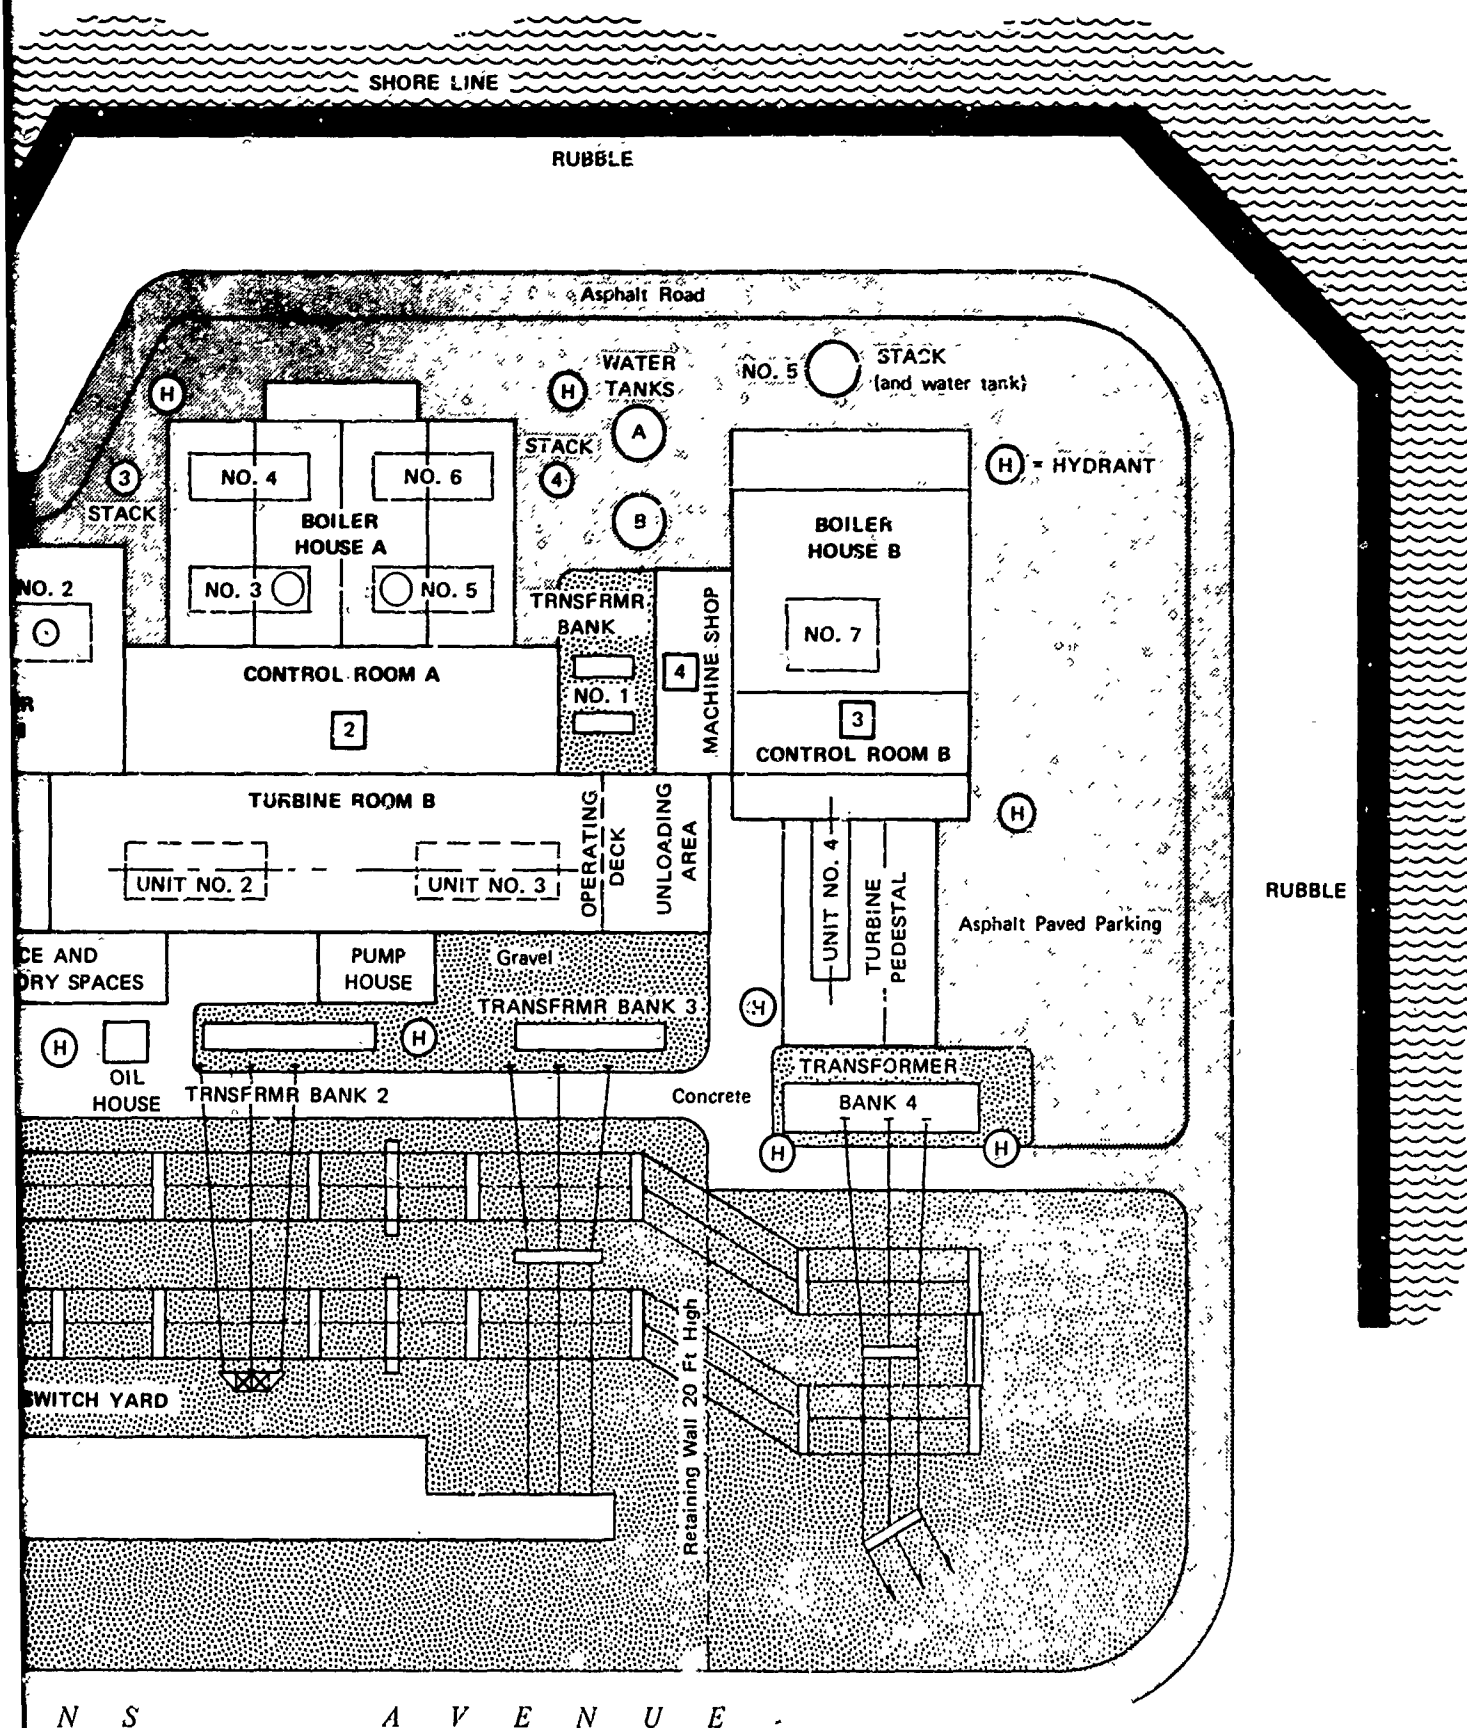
PLOT PLAN OF HUNTERS POINT POWER PLANT
